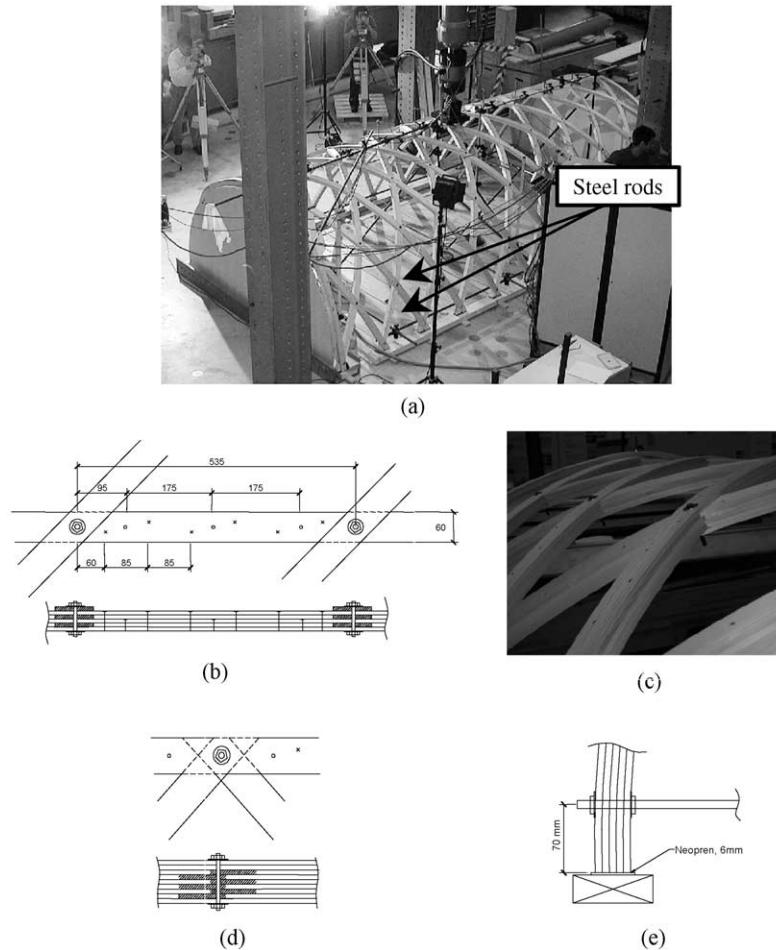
Test specimen and details of timber cross-ribs. (a) Experimental object of cross-ribs, (b) Dowling scheme and cross-points [dim. in mm], (c) Cross-points of ribs, (d) Cross-point at edge, and (e) Detail of support.
